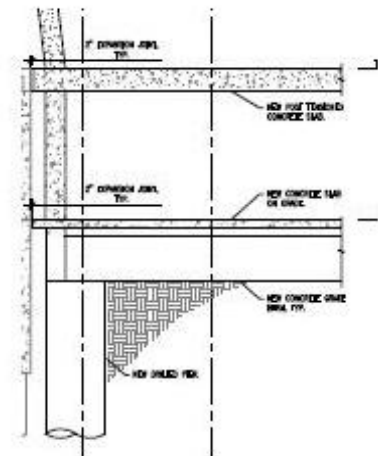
Column adjacent to existing Judicial Center resting on pier foundation
